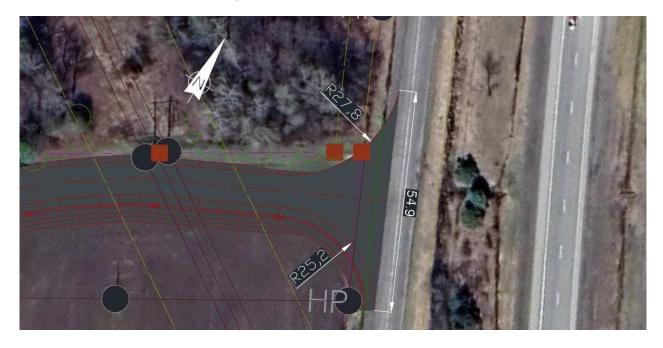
Geometric conditions intersection of William McEwen Drive and proposed site access road
